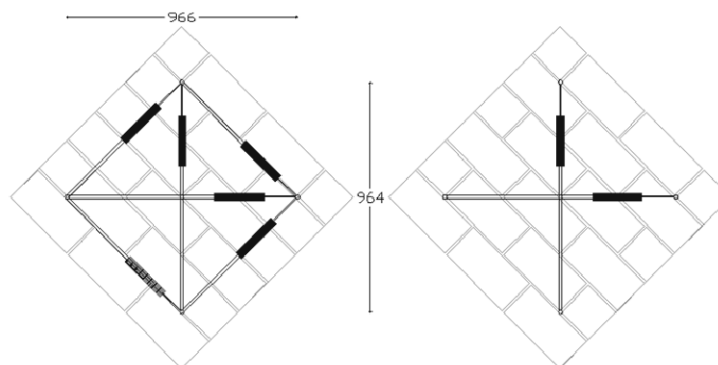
hollow brick panels layout of sensors on the wall compressed diagonally [mm]
